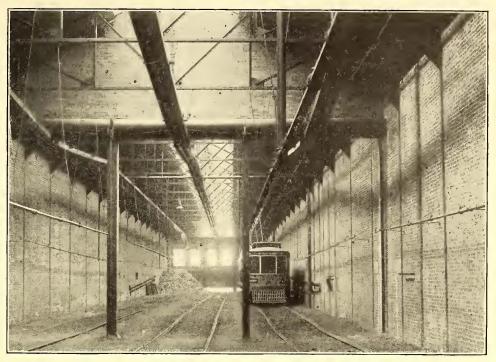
INTERIOR OF WINDERMERE CAR HOUSE, SHOWING ROLLER FIRE DOORS ROLLED UP
